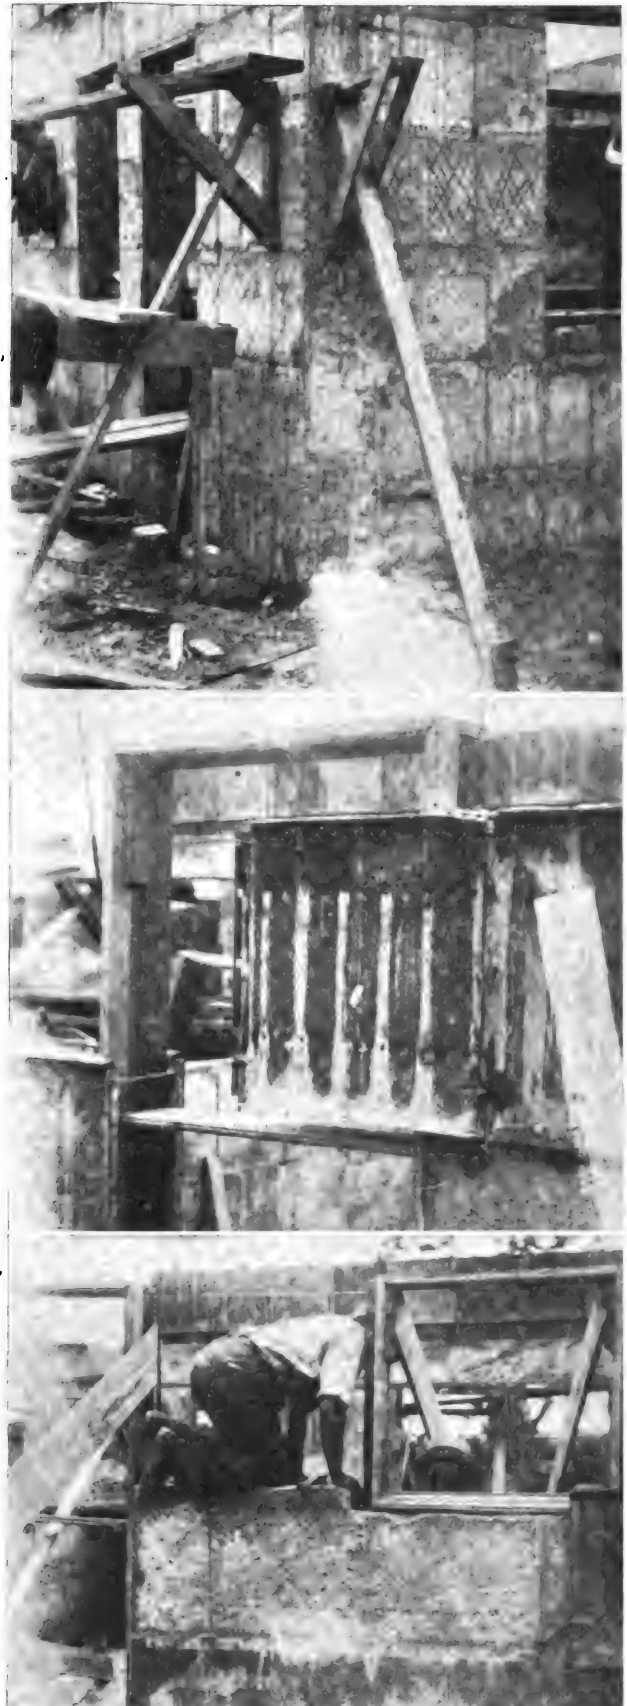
LIGHT, HANDY SCAFFOLD BRACKETS MERELY LEANED AGAINST WALL AND STAKED AT BOTTOM; STAGING PLANK NAILED TO PREVENT SIDE MOVEMENT
